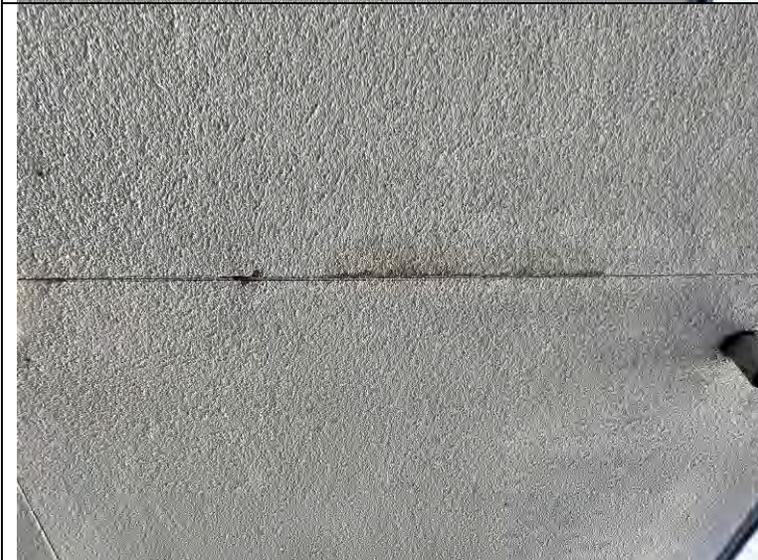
Overview of the area where test opening 4 was made by Wayne's Roofing personnel.
